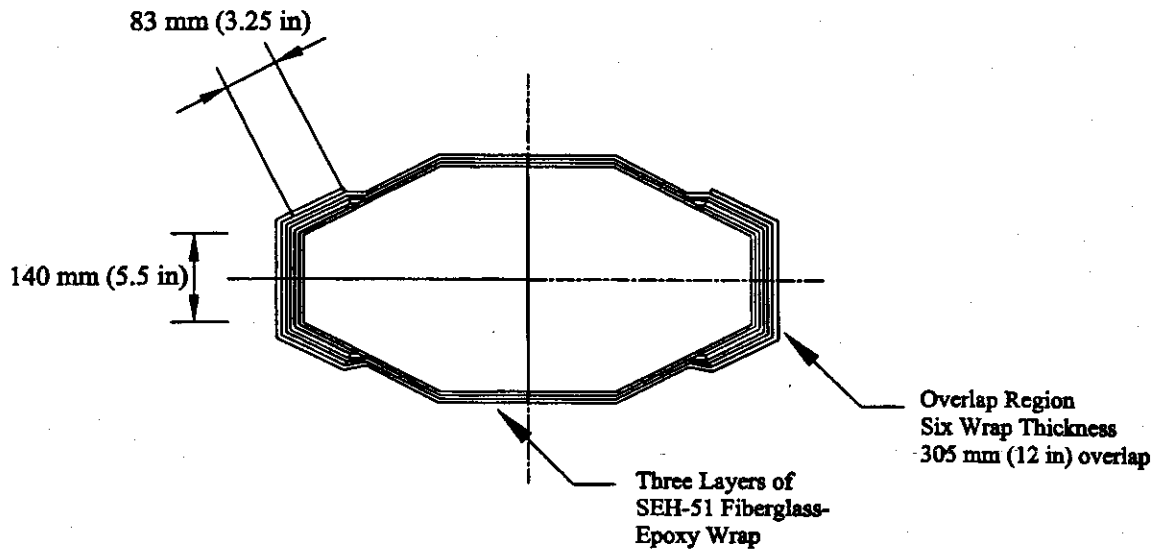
7 Typical FRG Jacketed Test Specimen Cross-Section
